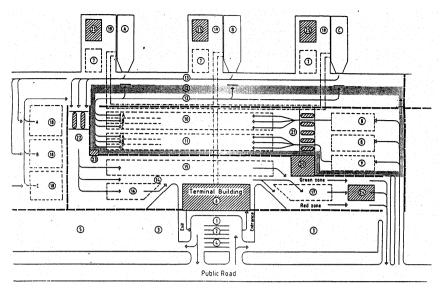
Typical ferry terminal (source: PIANC, 1995)
